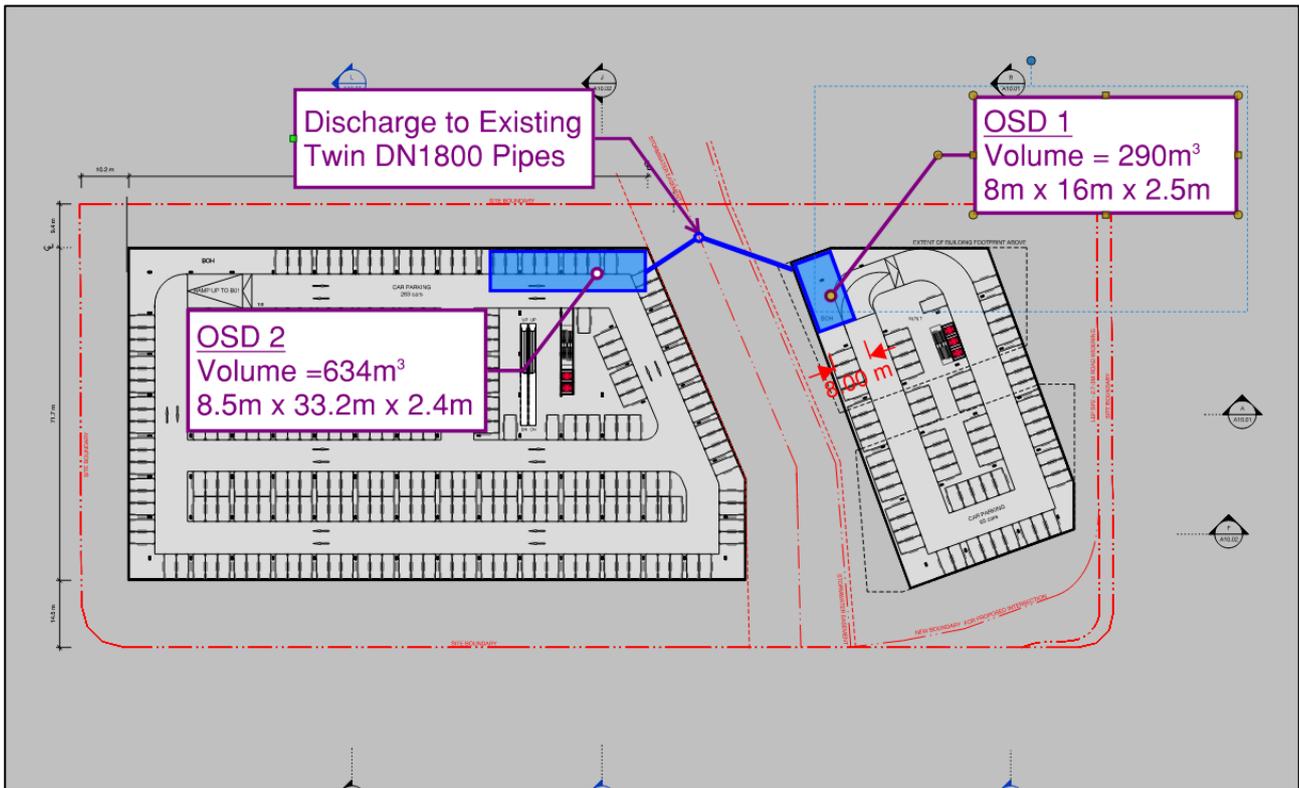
Proposed on-site detention tank locations at lower ground floor level.
